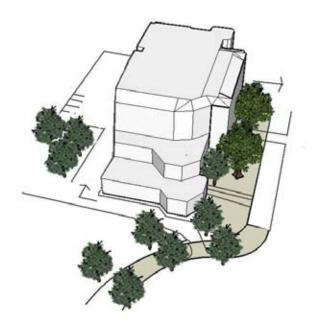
Buildings are articulated to provide aesthetic interest and maximize private spaces. Roof lines fit within the character of the surrounding neighbourhood.
